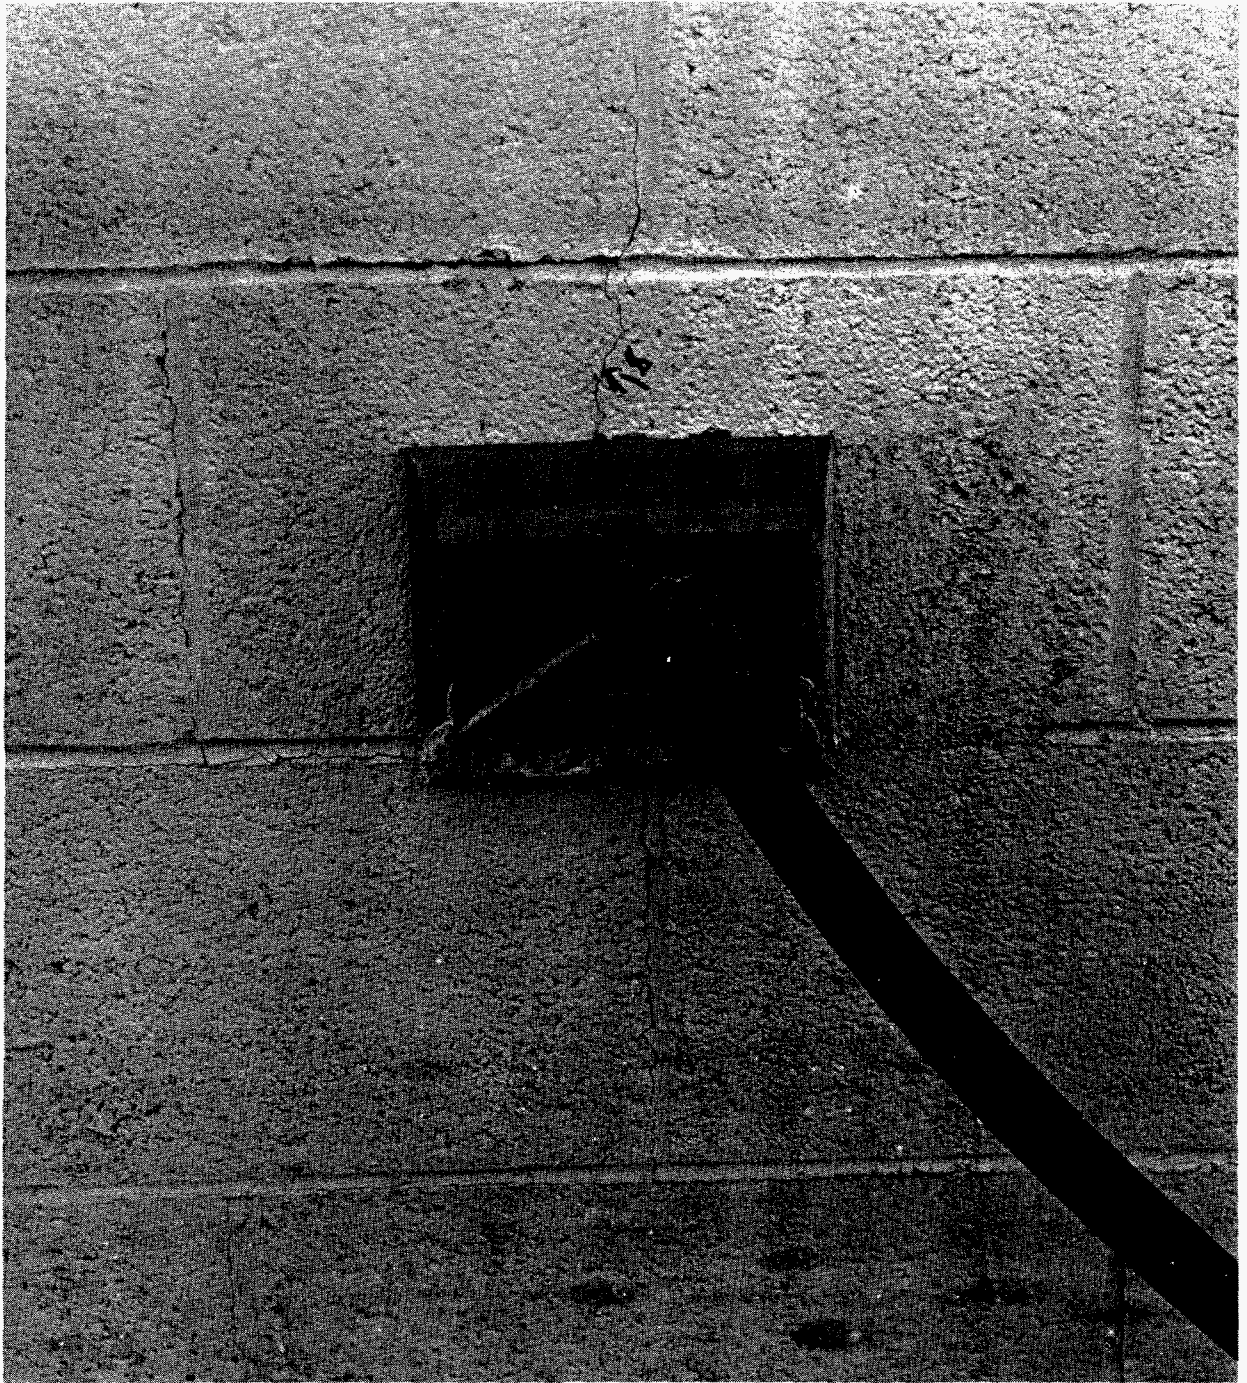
Building 790, west side, 0.13 cm/sec.
